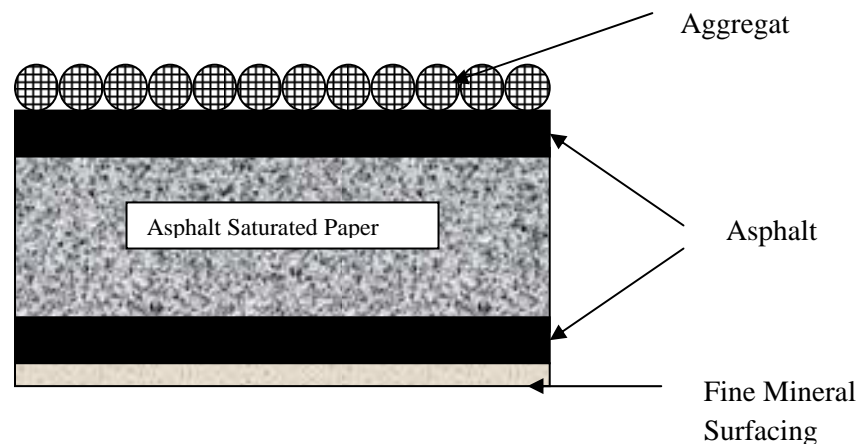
Profile View of a Typical Asphalt Shingle
